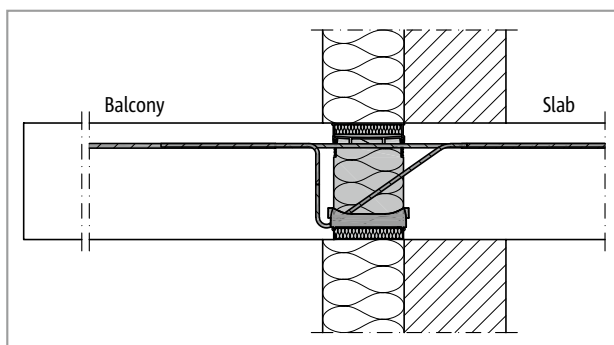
Schöck Isokorb® XT type K: Connection with thermal insulation composite system (TICS)
